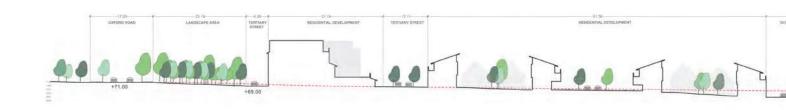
Site Section 02- West to East, cutting through the school's playing fields
